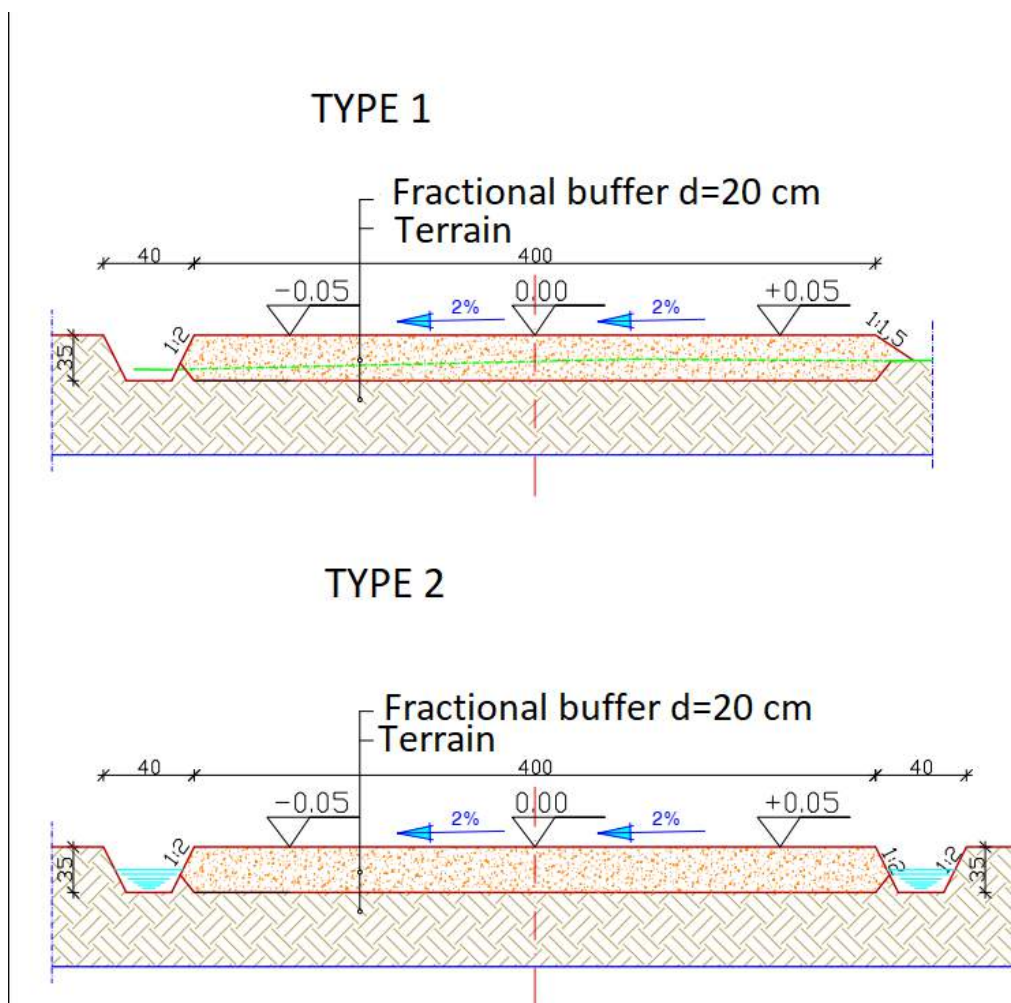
Layout of the planned reconstruction of the road from v. Jegunovce to mountain house Cer
